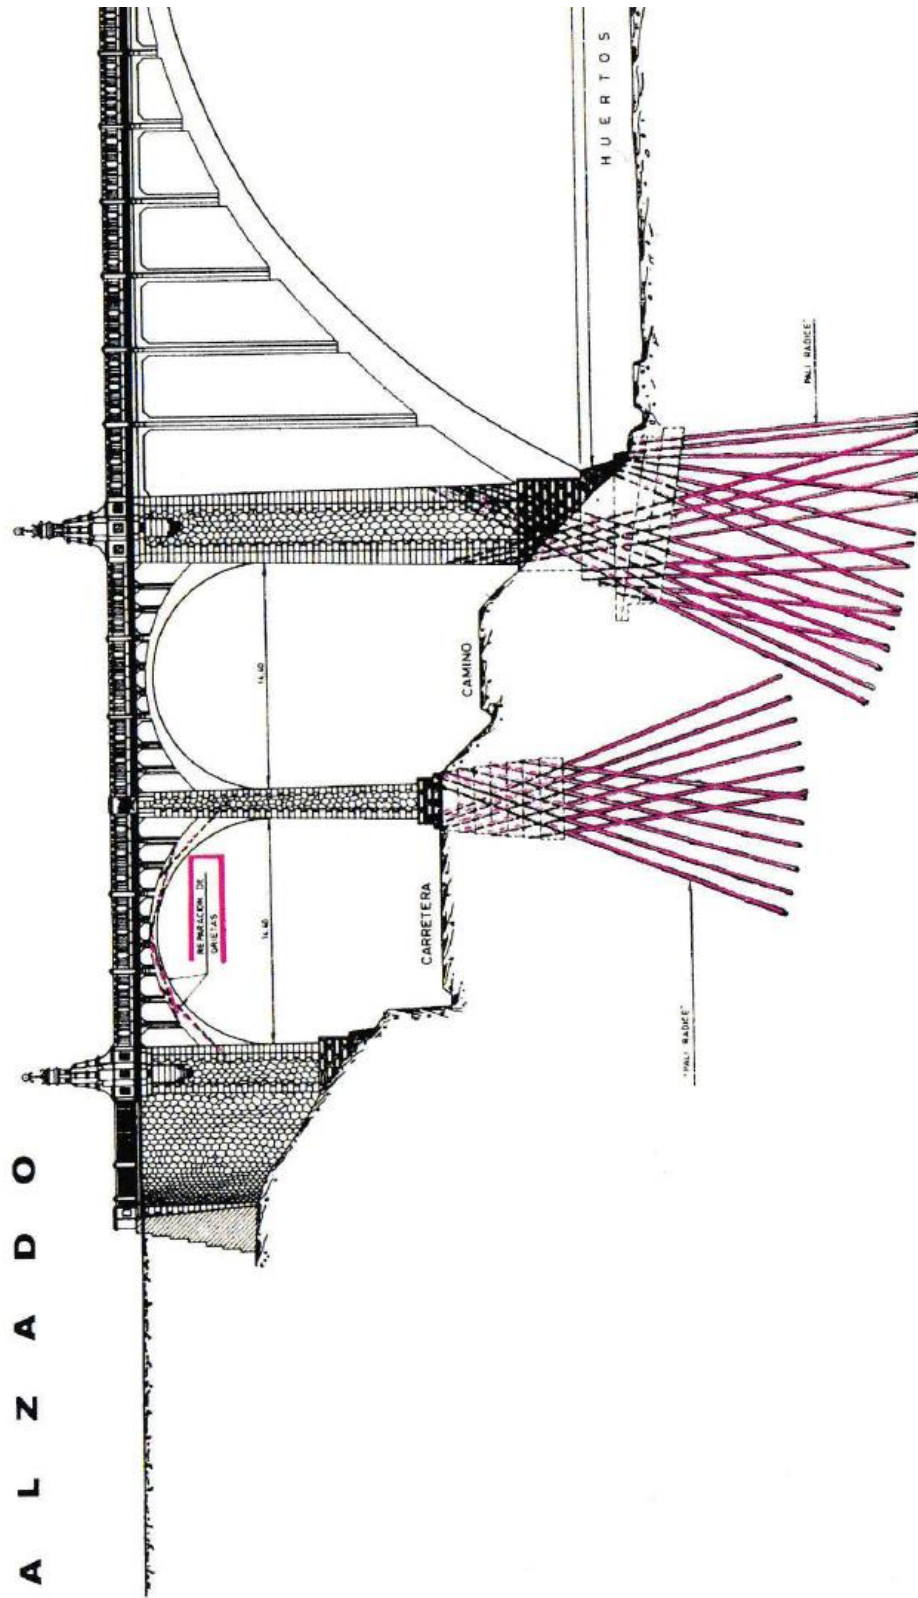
Underpinning plans of the viaduct using case 2 root piles (Lizzi, 1982)
